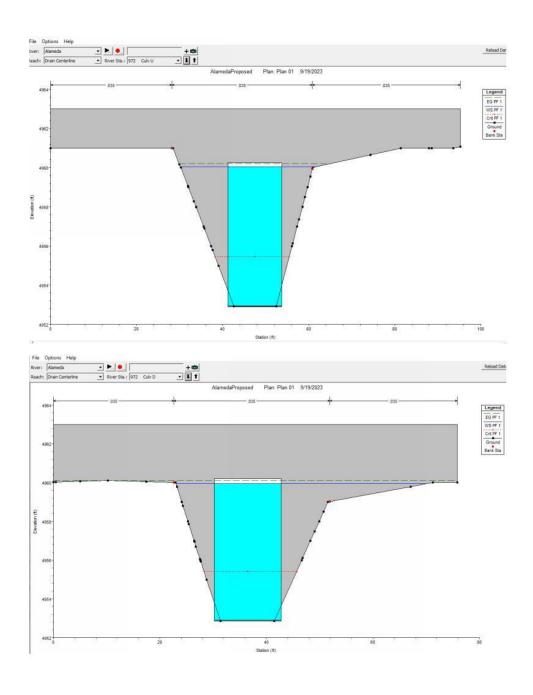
Proposed Conditions- Cross Section at Proposed Culvert (CABC)
